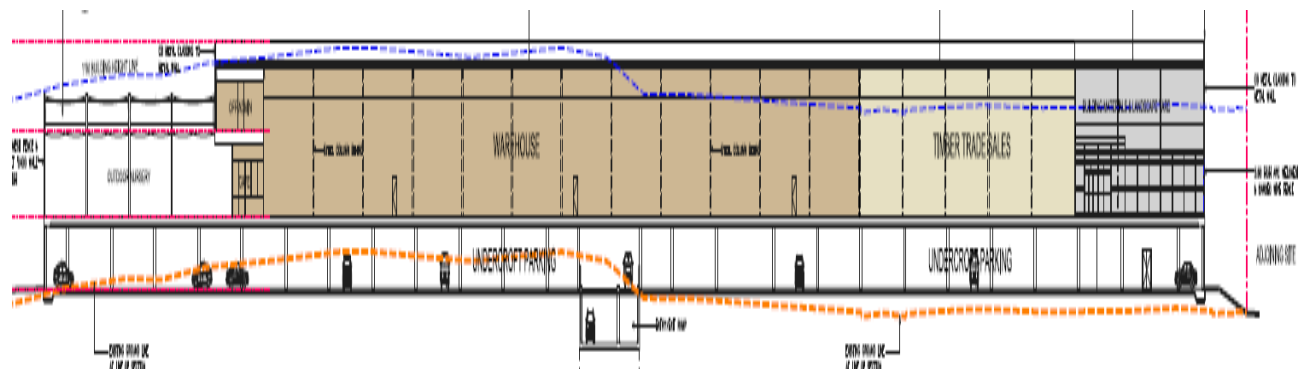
North South Section of proposed building with maximum building height of 16.6m circled in red.
